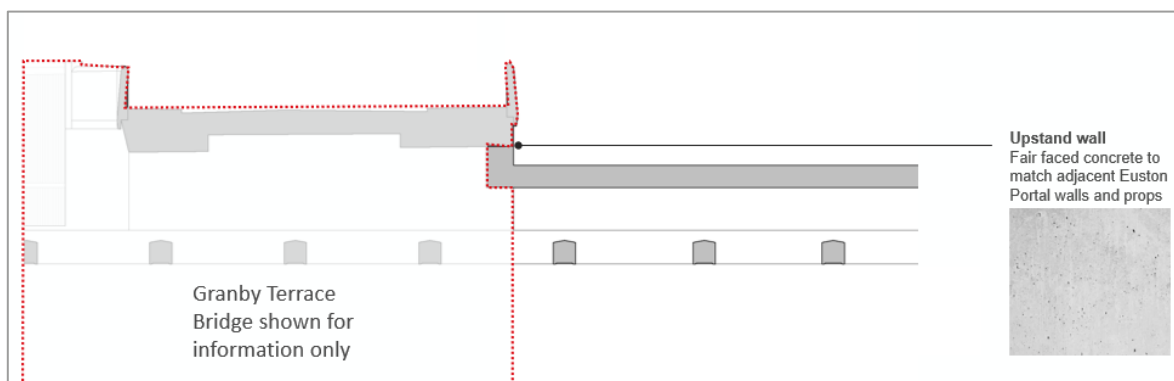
A long section illustrating the proposed interface with Granby Terrace Bridge
